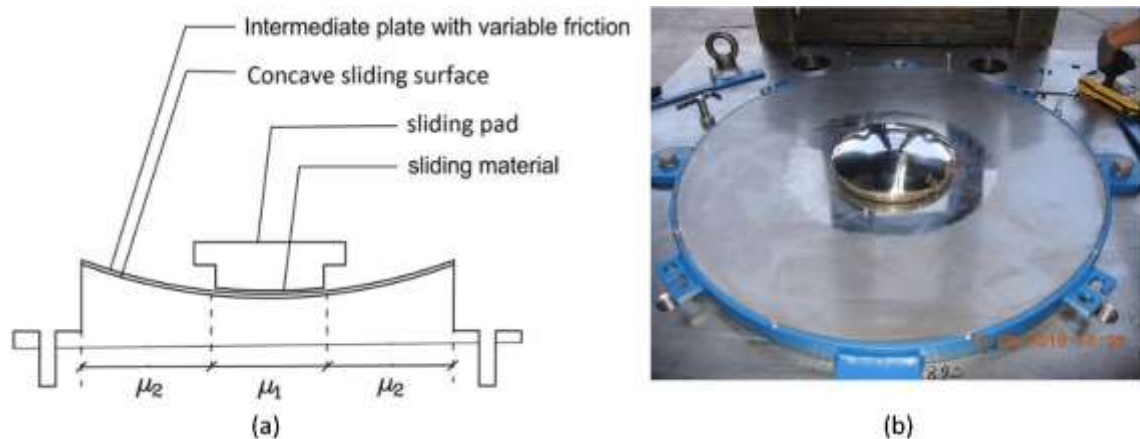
(a) Schematic drawing of a two-ring VFS bearing; (b) Plan view of the concave sliding surface and the slider of the prototype VFS bearing.
